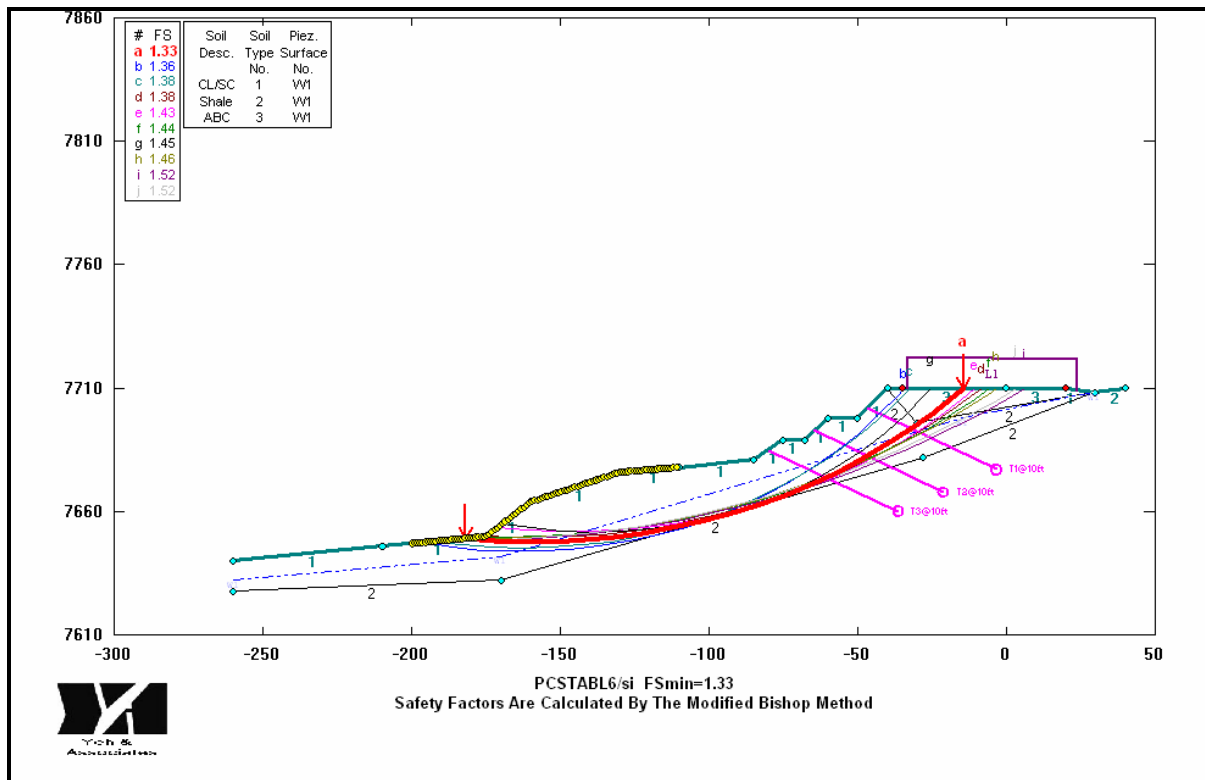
Typical Slope Stability Model of Ground Anchor Tieback System.
